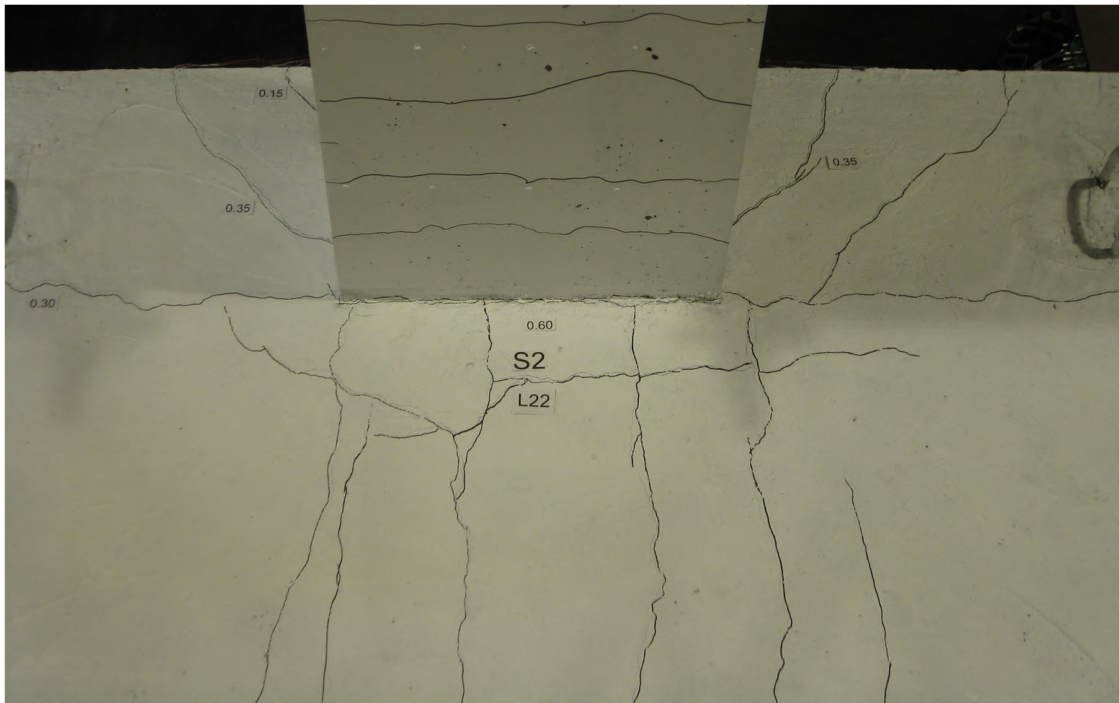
Specimen 2 slab cracks at $V = 235.0$ kN
